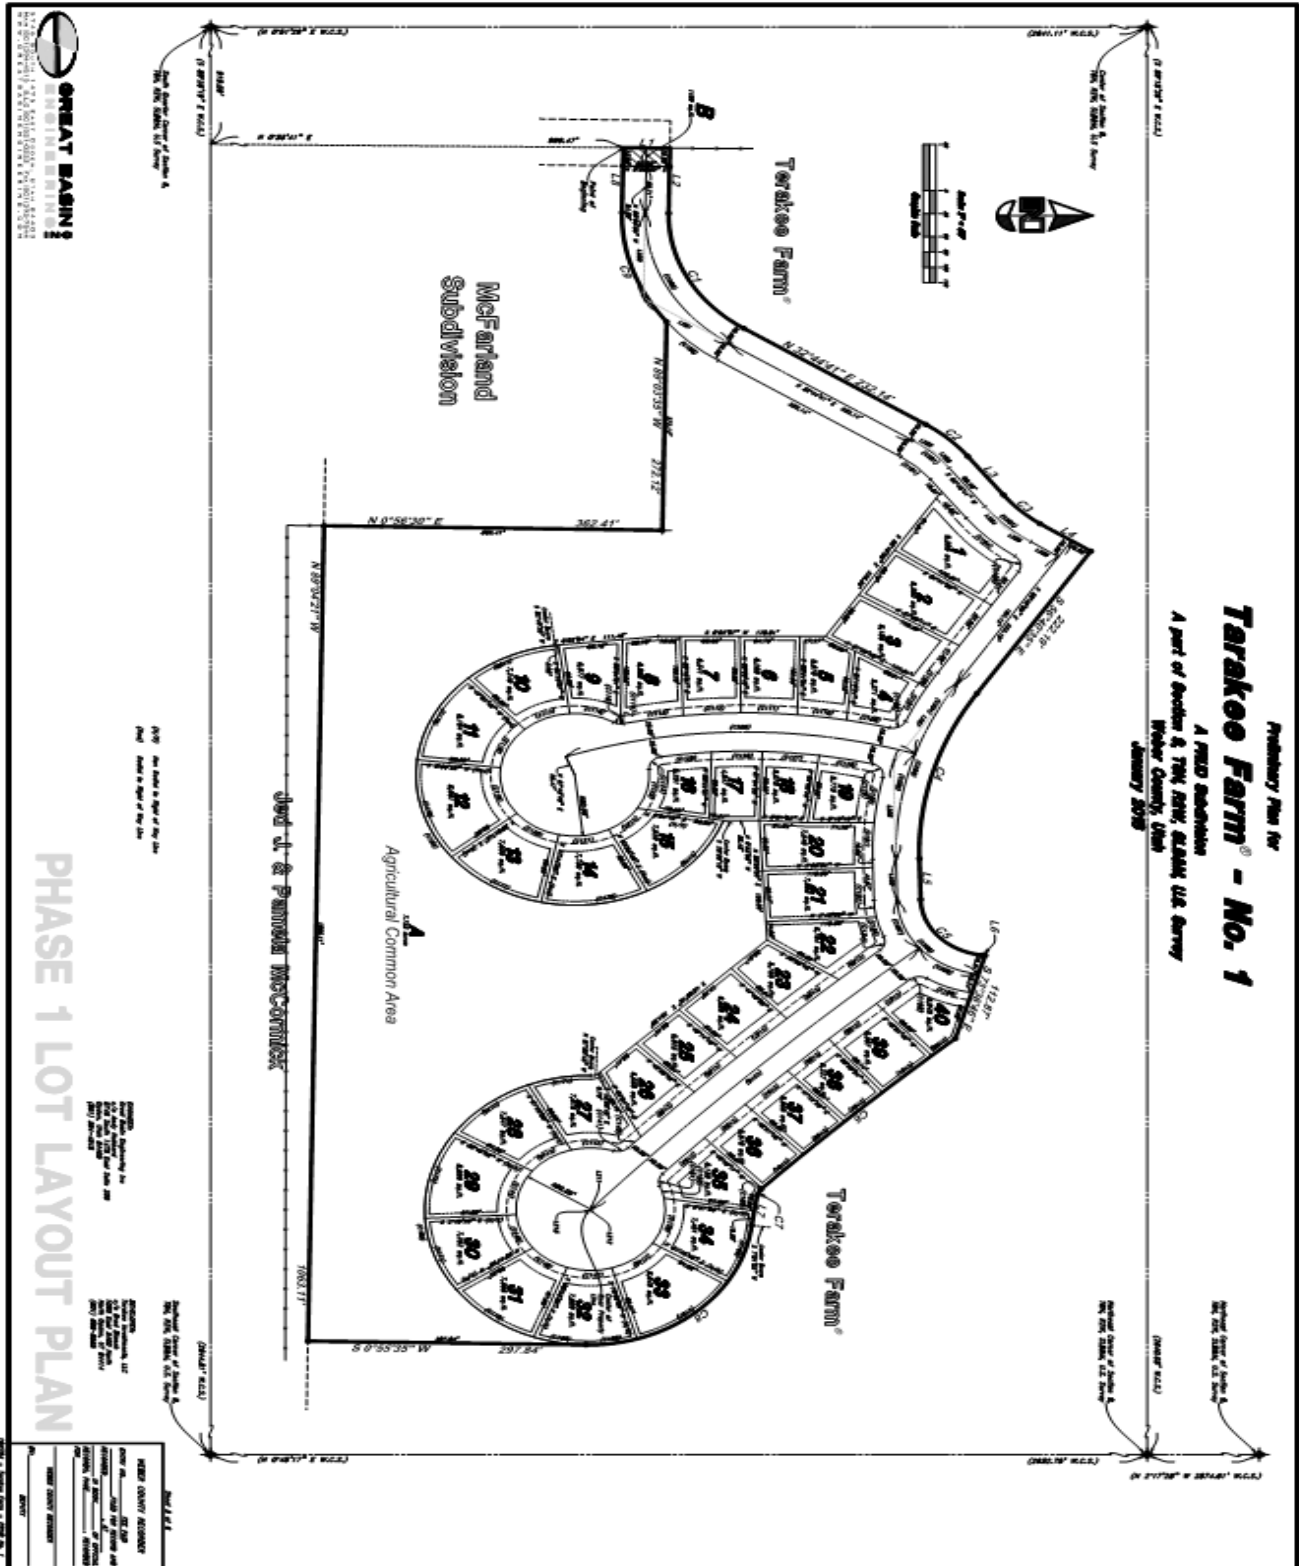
Exhibit B-Terakee Farm No. 1, a PRUD Subdivision Preliminary Plan
